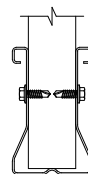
Detail E - Recommended fastener placement for multiple fastener count: Begin placing the fasteners in the center of the available area and expand toward the outer edges. Fastener quantity shall be specified by the approved truss drawings.
